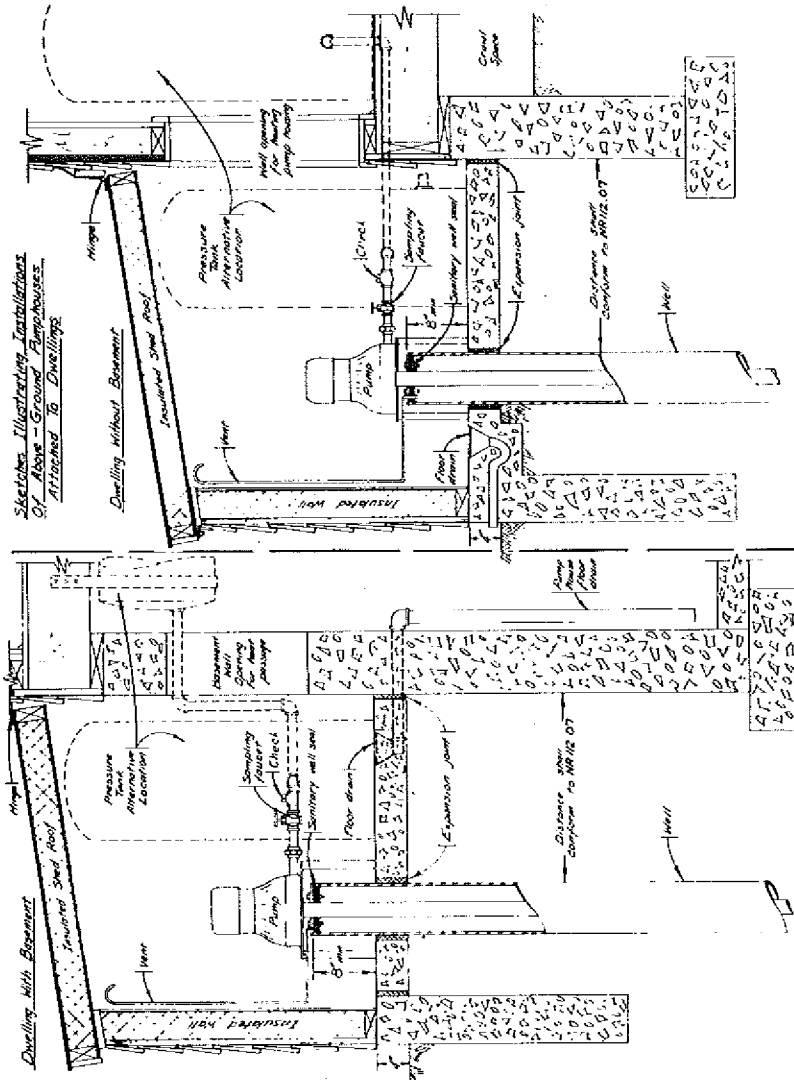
Insulated Pumphouse Adjoining a Dwelling.
